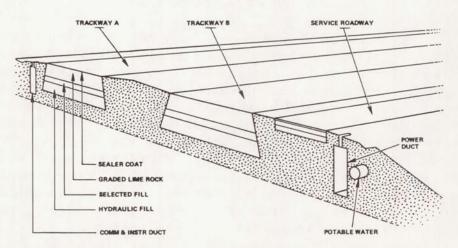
Typical cross section of crawlerway, as the design took shape in early 1963.
